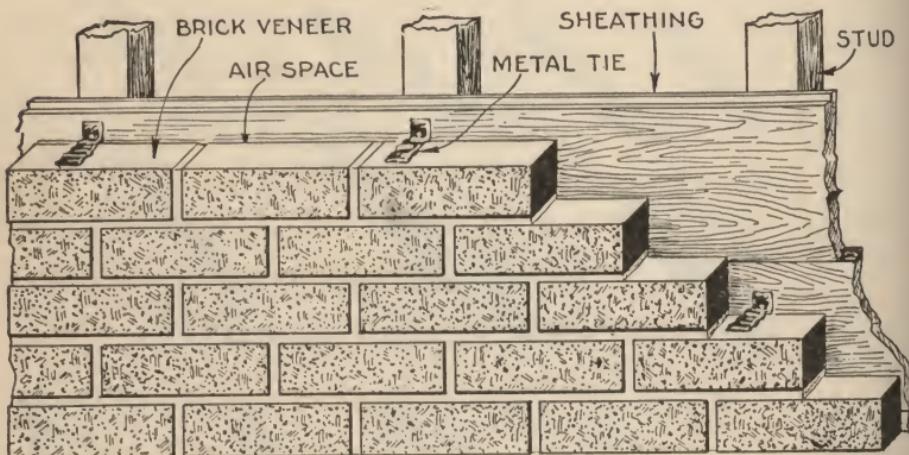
,192.—Brick veneer construction, showing the usual sheathed frame with bricks set one inch out (providing air space) and bonded with corrugated metal ties.
